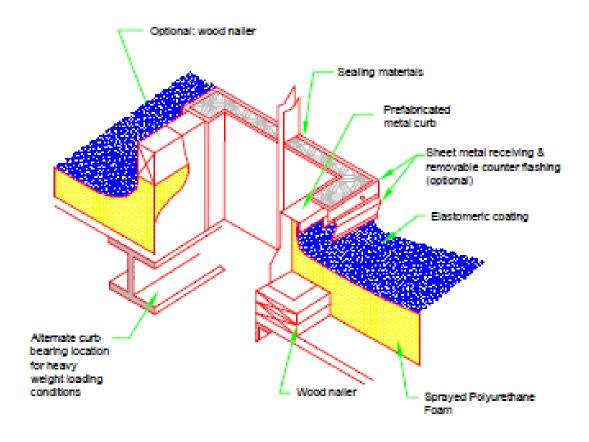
REMEDIAL PROTRUSION FLASHING
